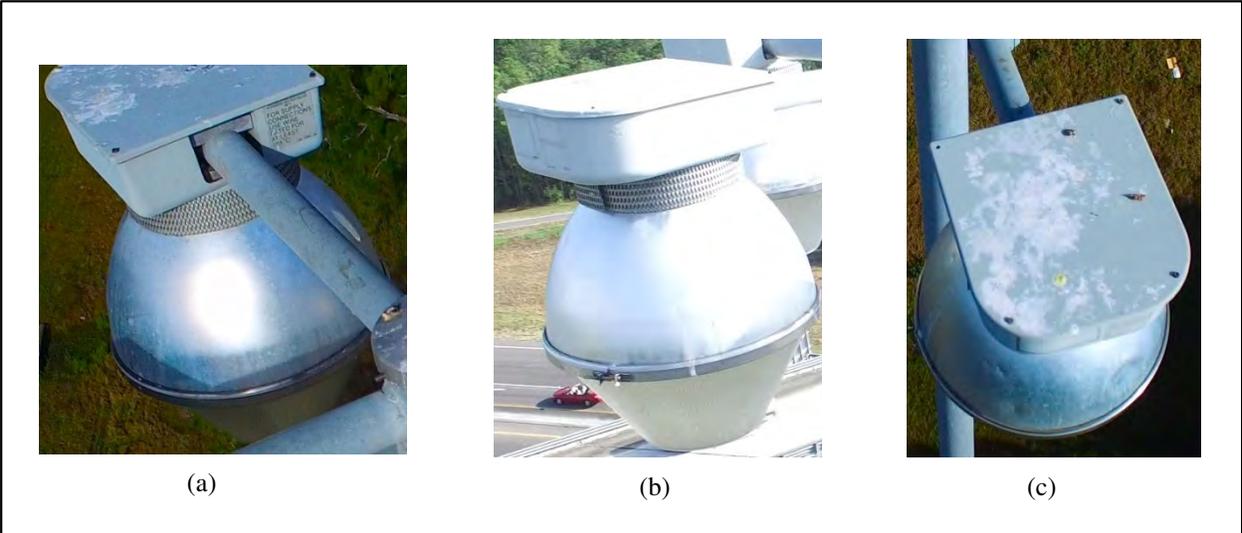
(a) Back (b) Bottom and (c) Top View of West Light Fixture
